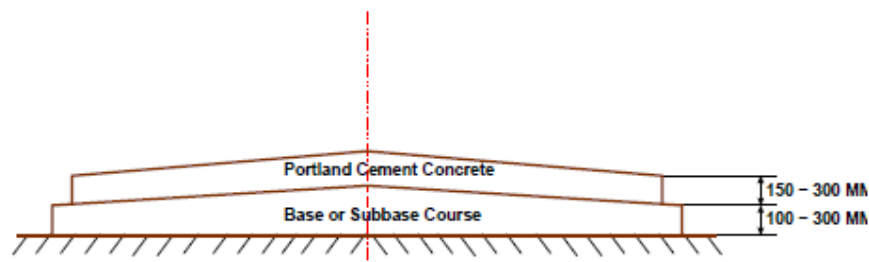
Typical cross-section of rigid pavement (Mathew, 2006)
